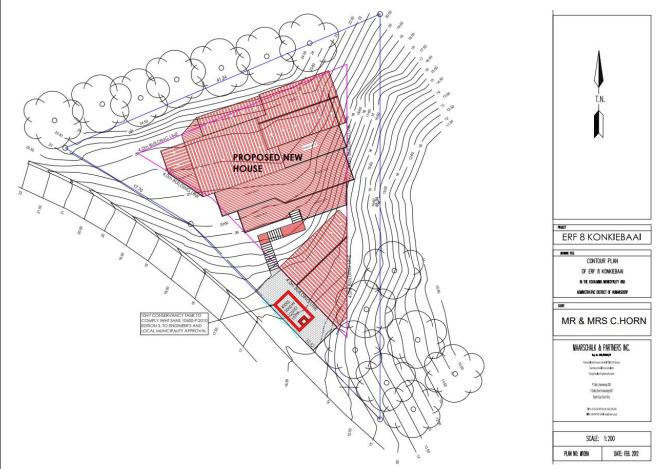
Layout Plan for proposed new house on Erf 8 Konkiebaai.
